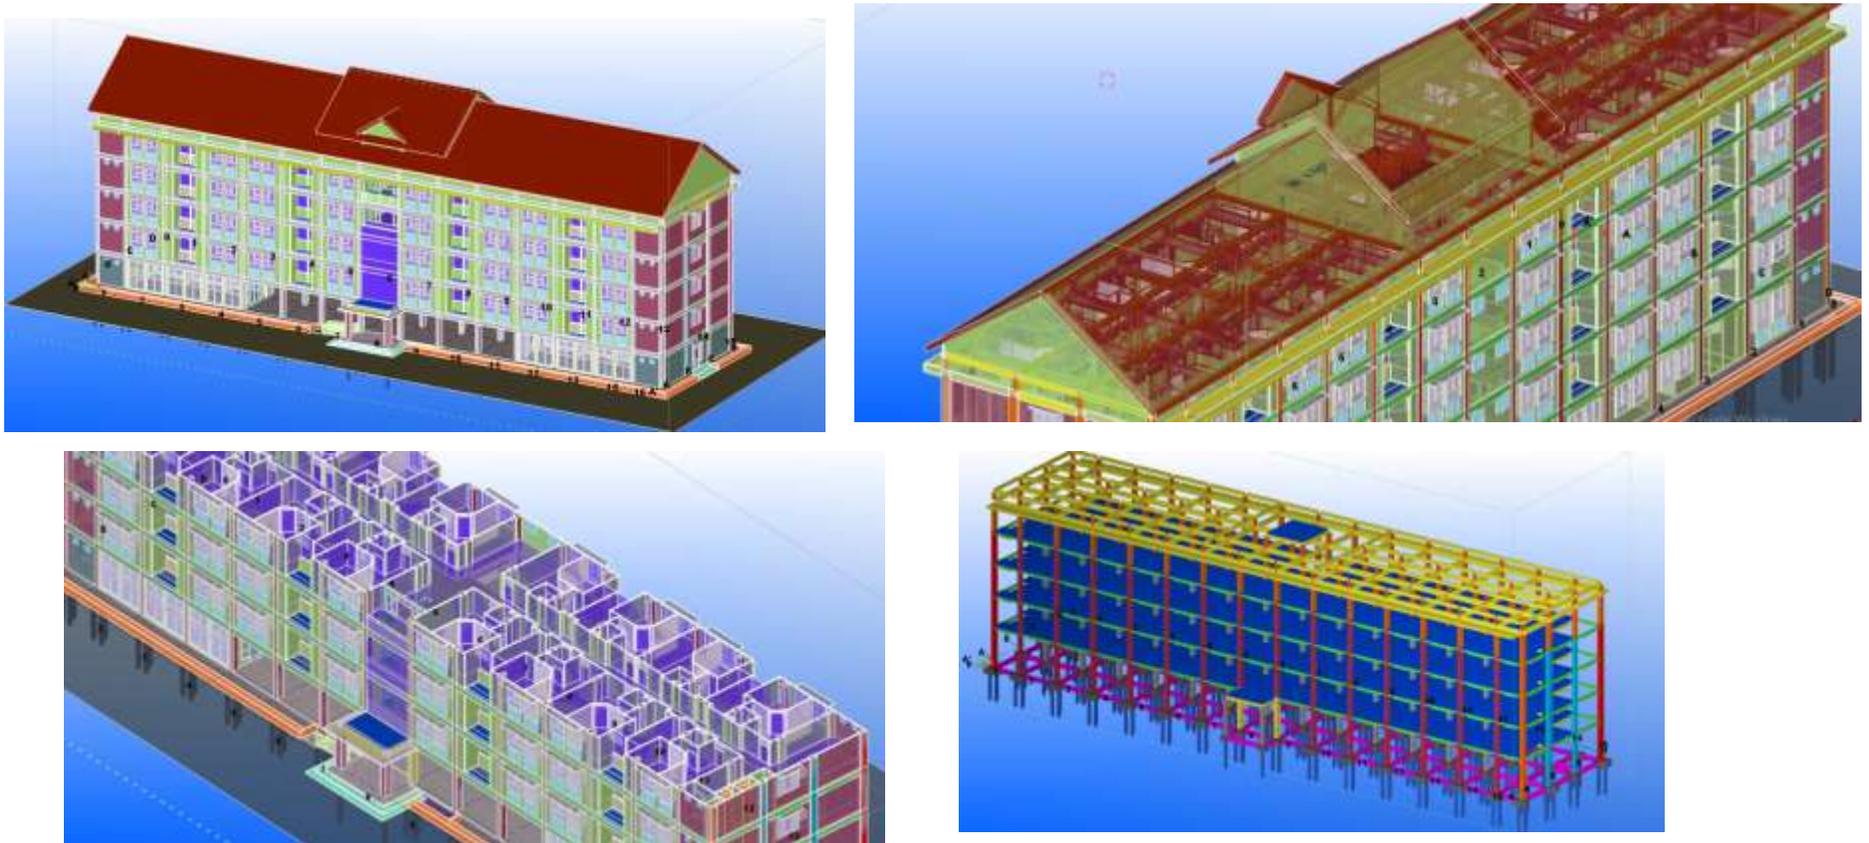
BIM Application in Precast Concrete Detailer in Low Cost Housing of Ministry of Public Works 1
